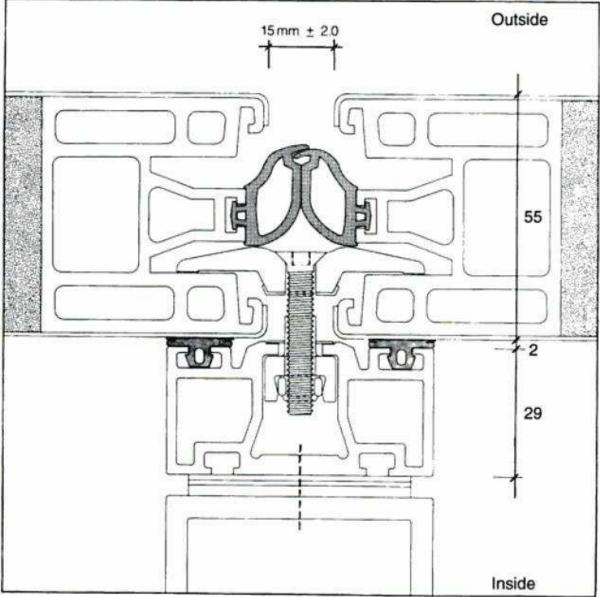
Typical Joint Detail (Source: Figure 8.2 Page 191, J.M. Davies, *Lightweight Sandwich Construction*, 2001)
